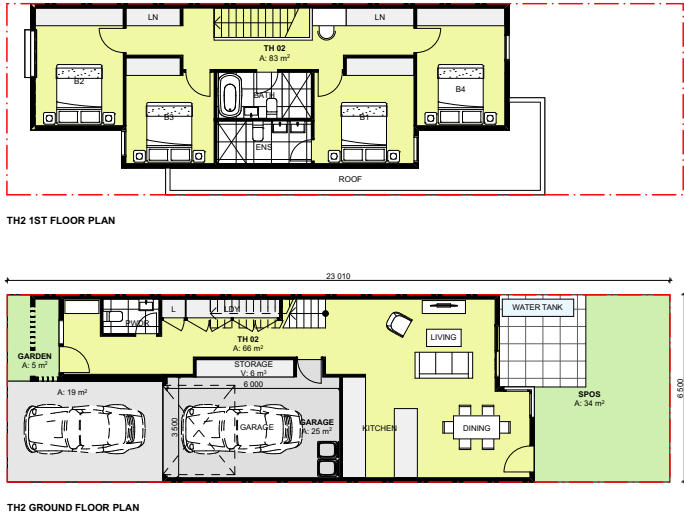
Townhouse Type 02 (Source: Plus Architecture)
